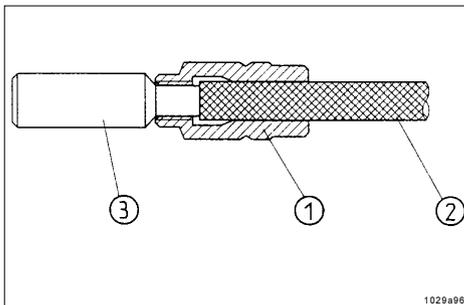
Preassembly of the threaded sleeves by means of an adjusting gauge
